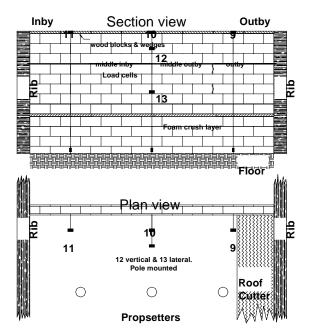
Stopping at crosscut 33 showing construction and instrument locations
